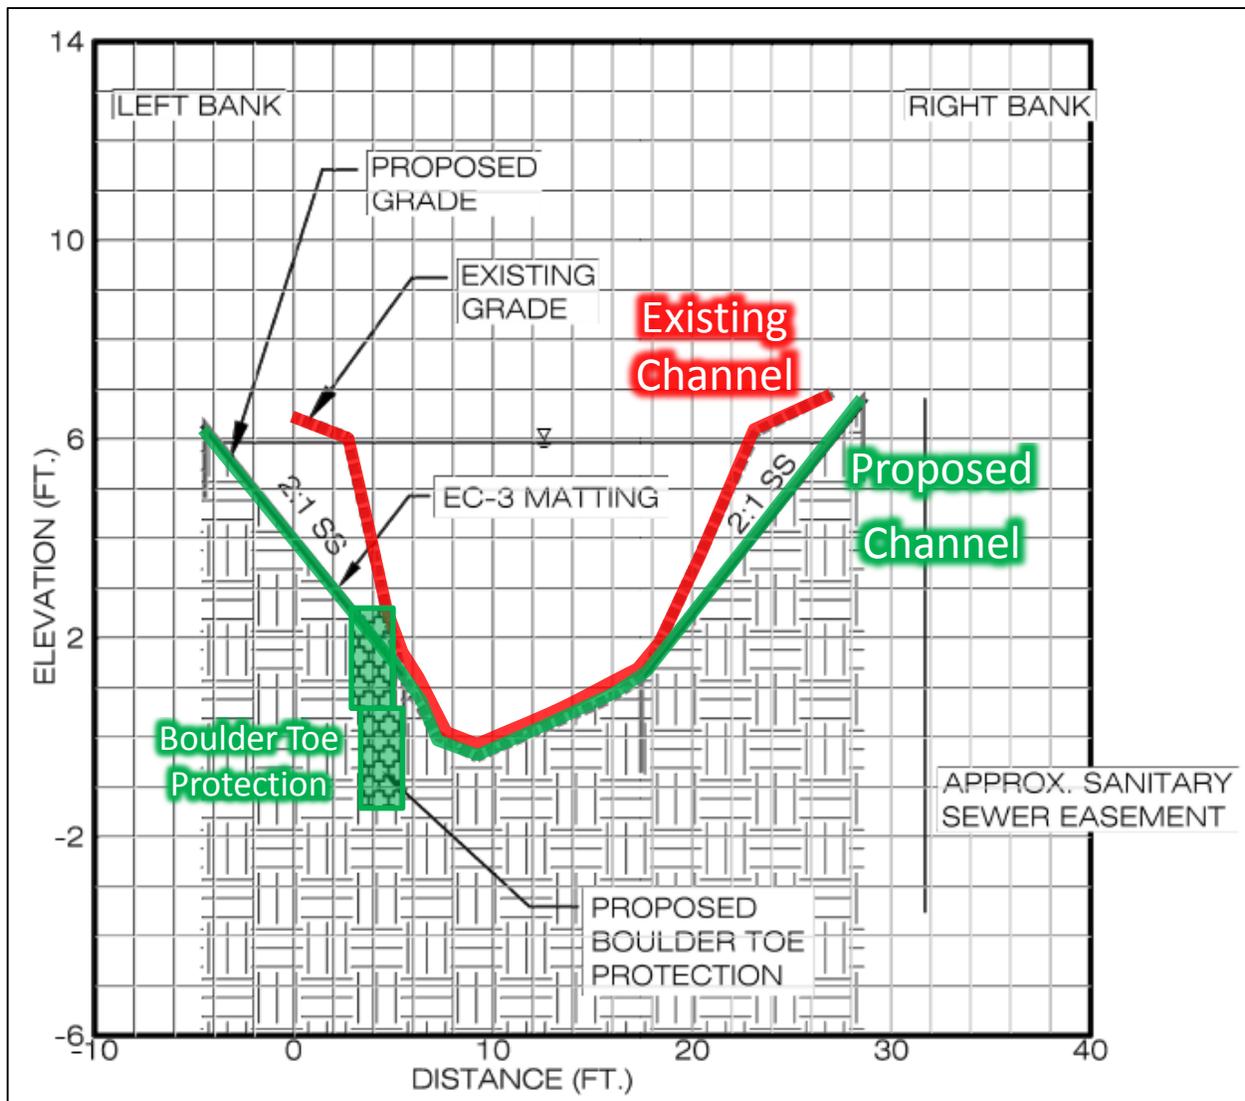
The proposed stream cross section would eliminate the steep slopes caused by erosion and, in this location, use a 2:1 or 50% slope coupled with stone reinforcements to create a more natural condition stream channel (Source: Stantec, 12/18/2015)
